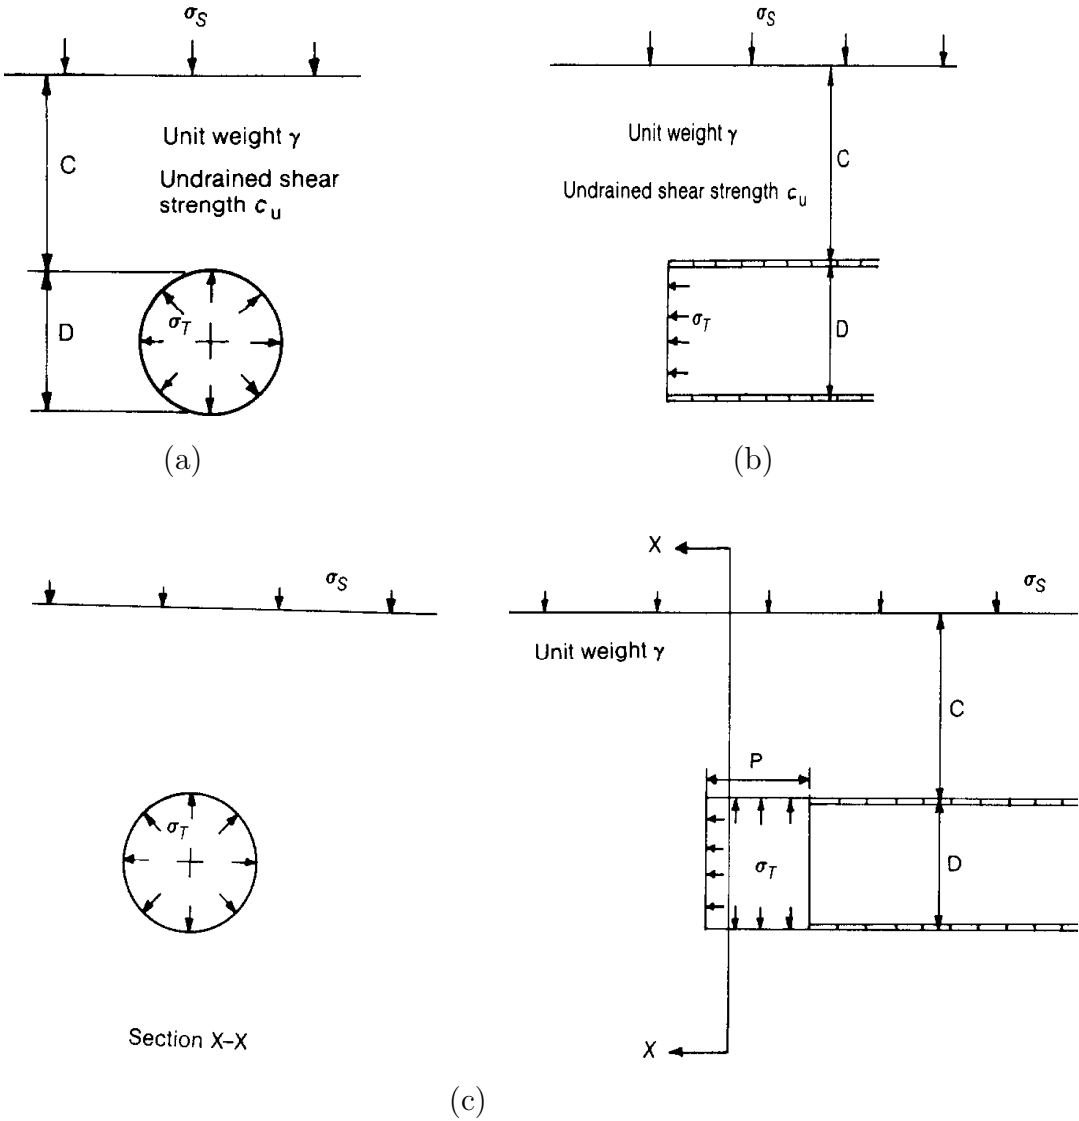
Lower bound solution for tunnel heading, Davis et al. (1980): (a) plane strain circular tunnel; (b) plane strain tunnel heading; (c) circular tunnel heading for fully lined tunnels
